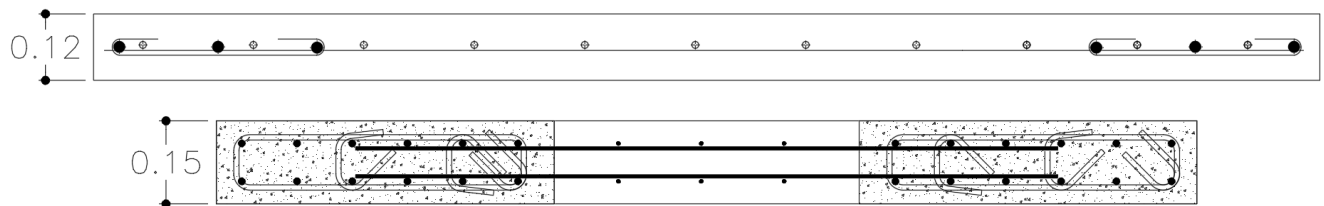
Reinforcement detailing of longitudinal reinforcement concentrated at the edge of walls with thickness lower than 150 mm, and confinement in boundary elements for 150 mm walls (units in m).
